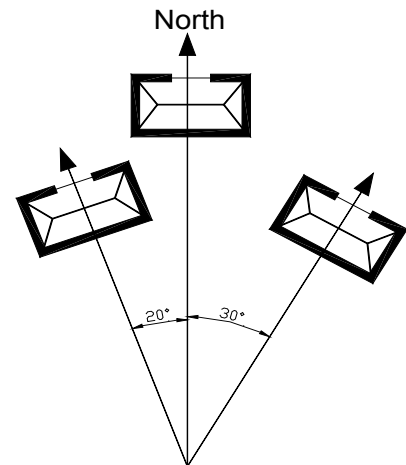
Desirable range of window orientation for north facing windows.
